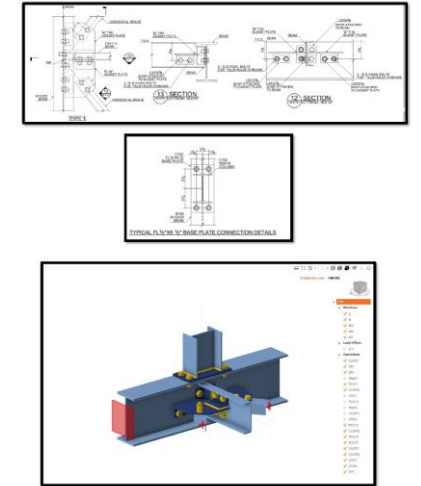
C16 Connection, Drawing E110, E113 Section 43-44, EL. 21' 11 1/2"
